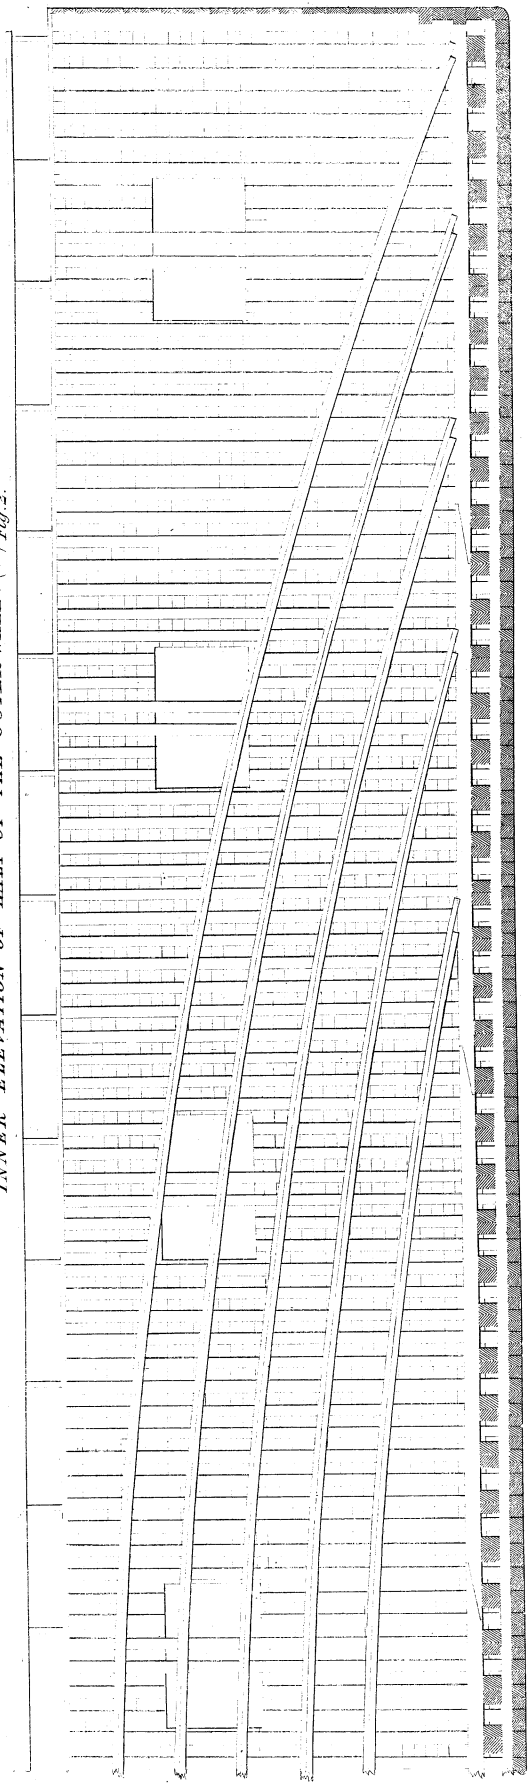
INNER ELEVATION OF HALF OF THE OUTER WALL. (C.)
